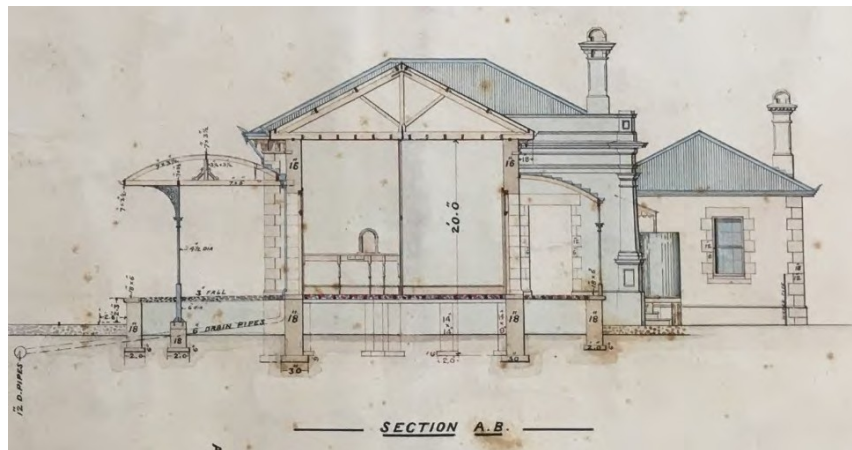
Original section through Booking Office – note curved roofs to verandah and platform awning - extract from drawing dated 25.5.1886. Source: QSA Series 17692 Plans of Queensland Railway Station Buildings etc., Item ID 120966.
